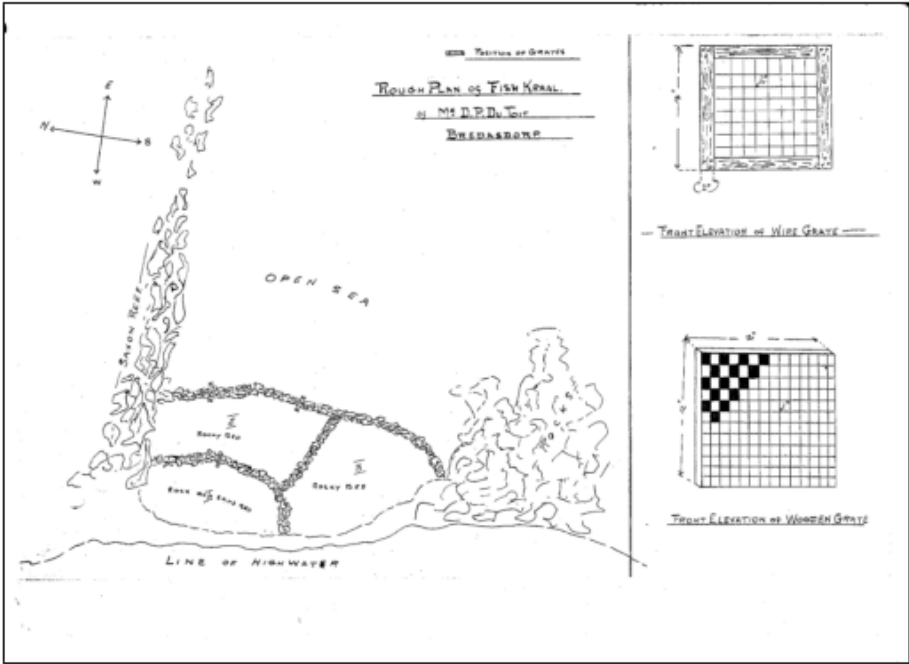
Top and bottom: proposed plans for fish traps in Struis Point, 1913, are kept in the Cape Archives.
